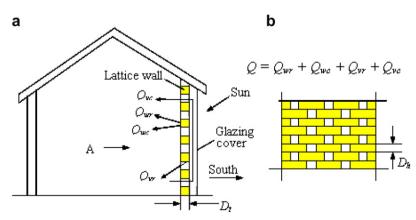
Lattice wall and lattice wall heated building. (a) Lattice solar wall heated building, (b) lattice wall from view A.
